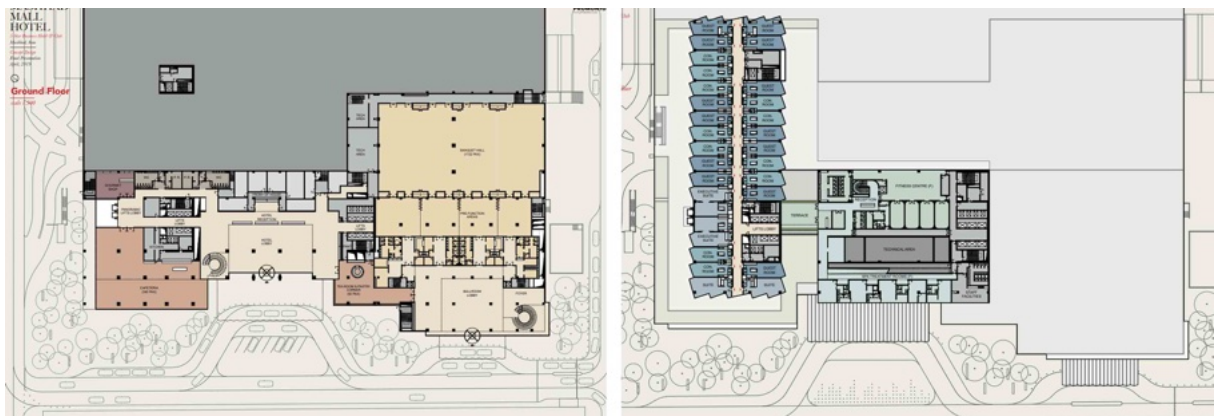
A: Ground Floor/ Entrance level plan B: 8th Floor Plan with Hotel tower floor and Clubhouse
